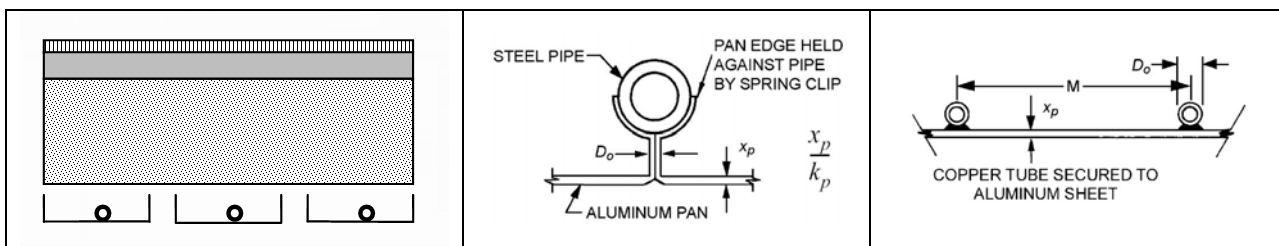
Ceiling panels structure; covering, floor, concrete slab, air space (or insulation), panels; construction of critical detail
